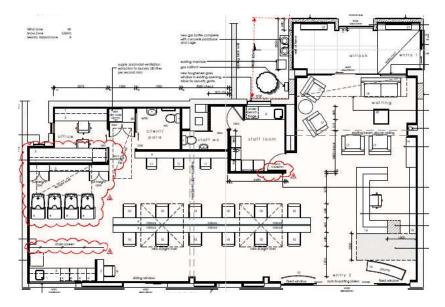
Building Floor Plan from 2010 drawing by Design Base Ltd
